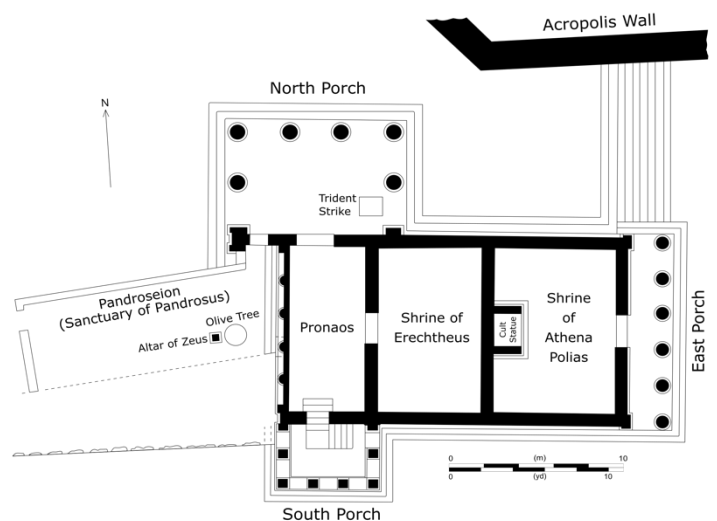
Floor plan of Erechtheion. CC by SA-40.
